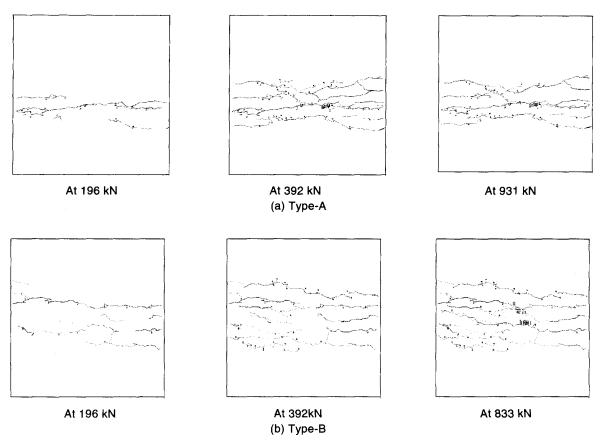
Crack patterns of upper slab of precast box culvert specimens
